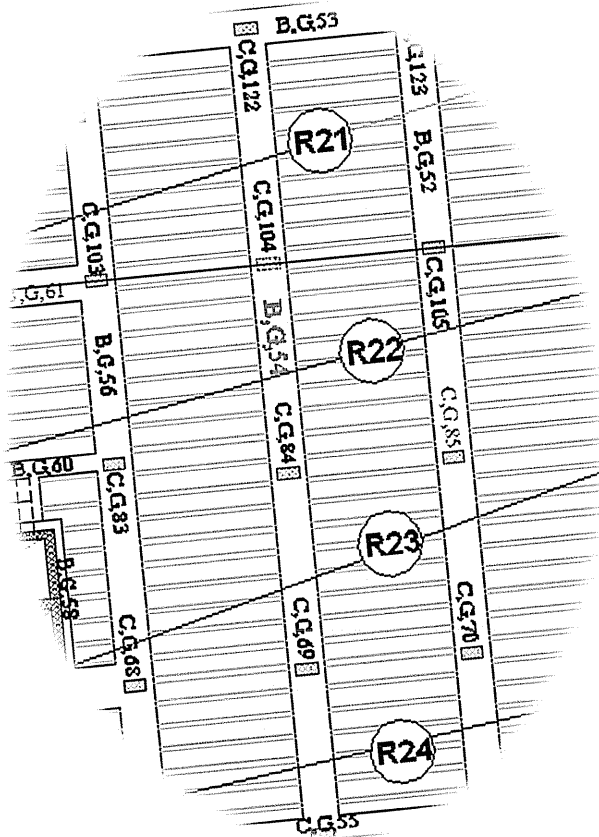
Top reinforcement in Y-dir. Basement floor.
